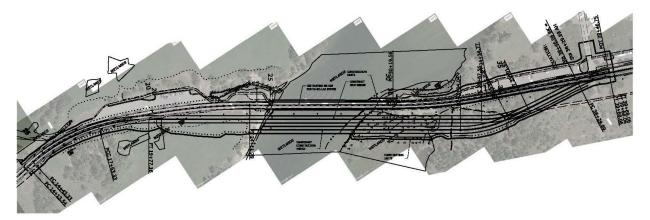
Alternative D "Reconstruct Fishing Bridge in New Location"
